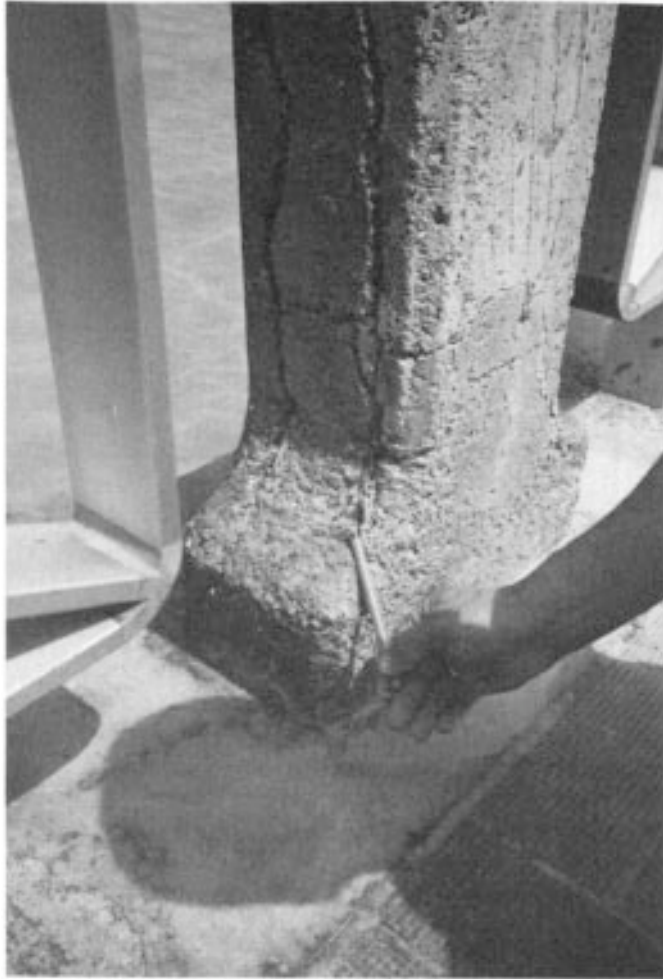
Cracking and spalling in concrete column due to rebar corrosion caused by chloride-contaminated aggregates. Courtesy, A/S SCancem, Norway.
